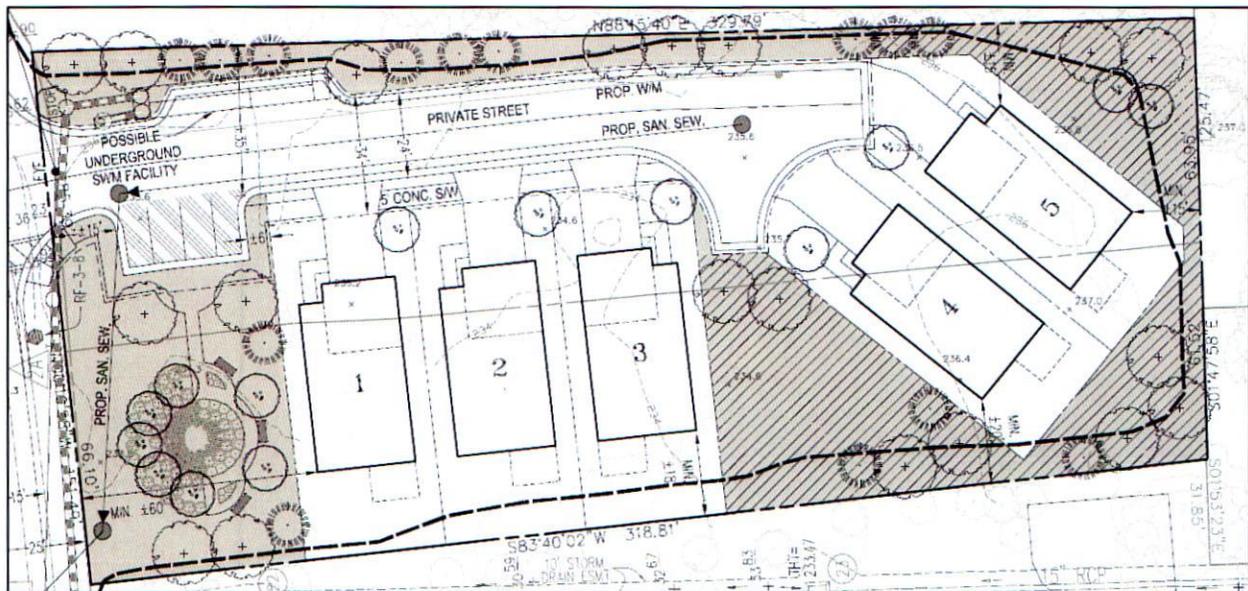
The applicants' landscape plan (Source: Urban, Ltd., 9/24/2012)
